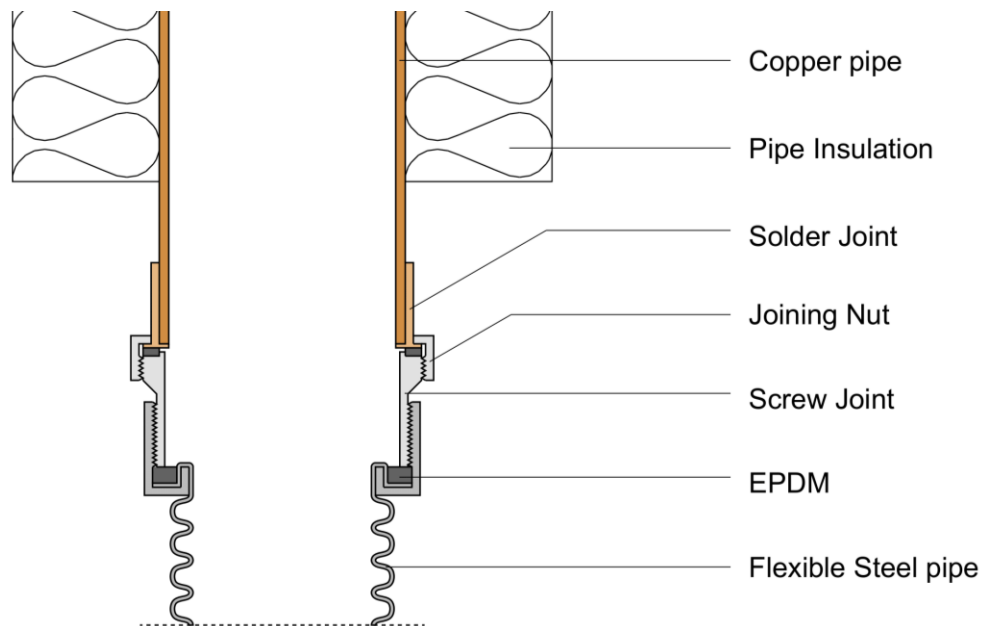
Detailed section of joint between copper piping and flexible steel piping.
